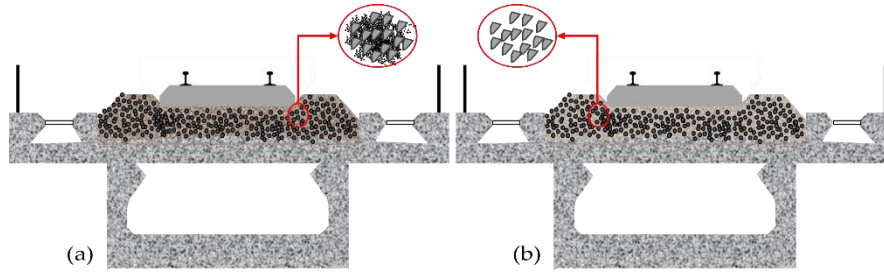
Ballast fouling over the bridge a) fouled ballast and b) clean ballast
